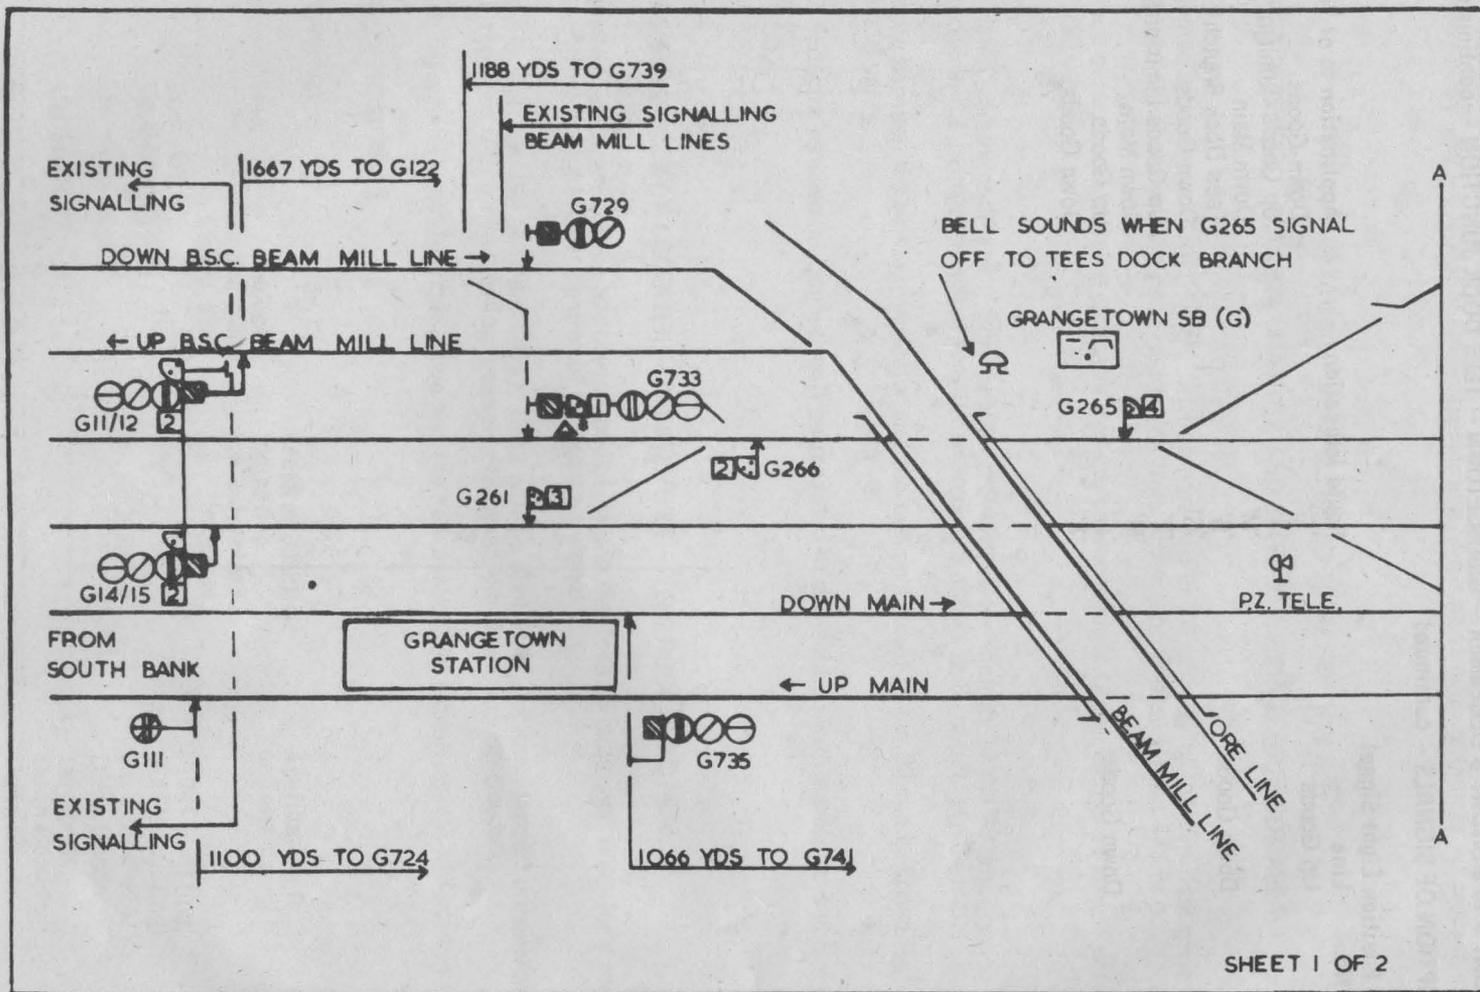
DETAILS OF WORK REFERRED TO IN SECTION B - continued
